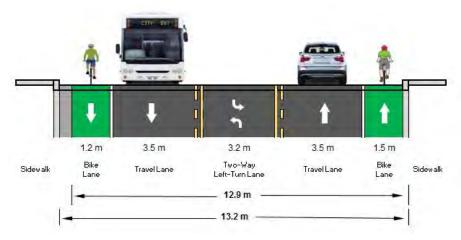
Proposed Configuration between Sackville Road and Great Northern Road (Section B)
